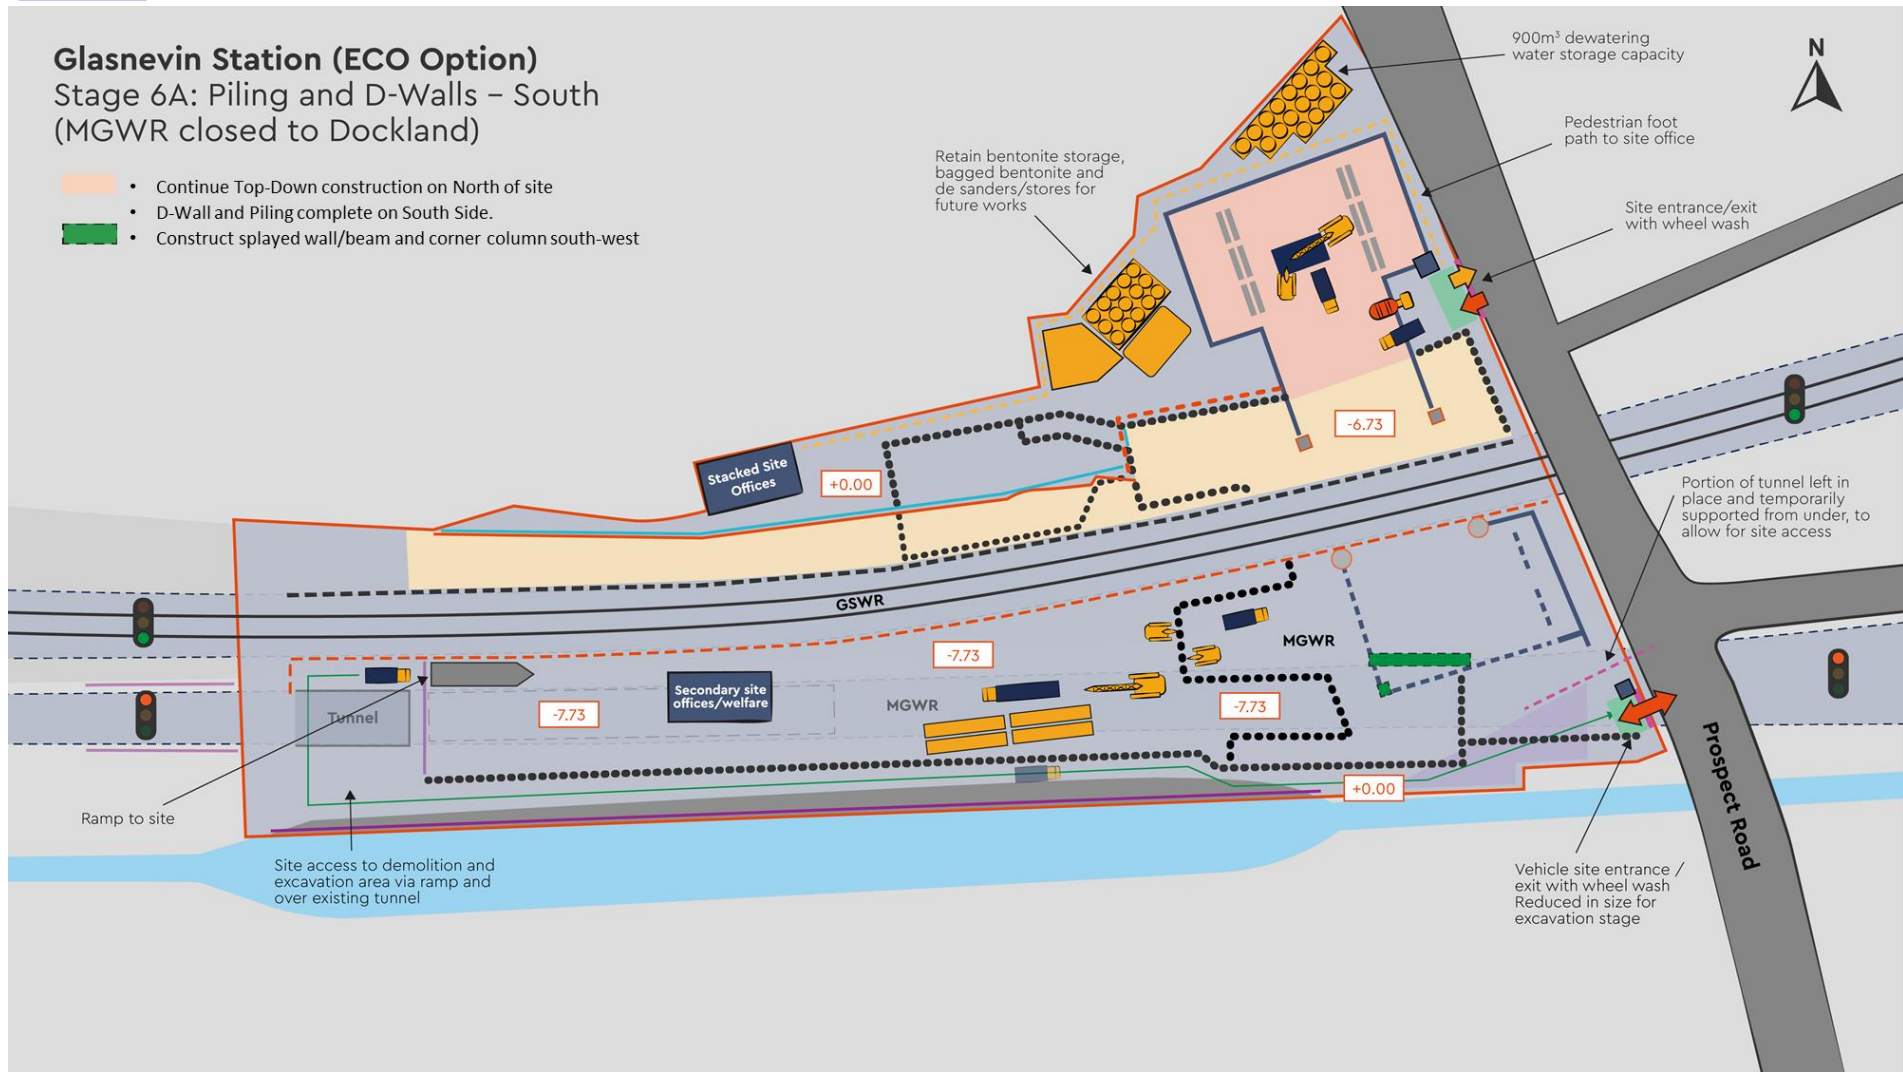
Glasnevin Station Stage 6A Piling and D-walls - South
